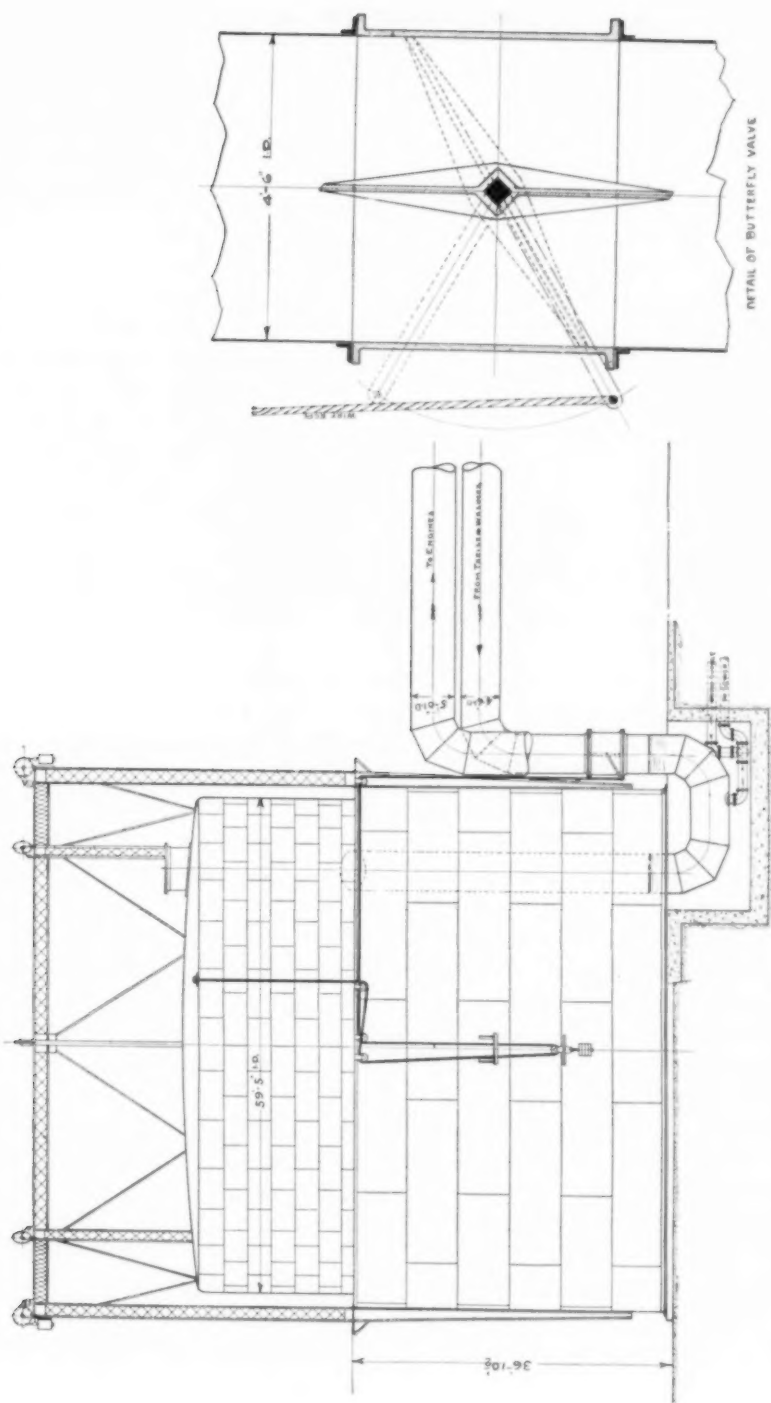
GAS HOLDER AND AUTOMATIC BUTTERFLY VALVE
